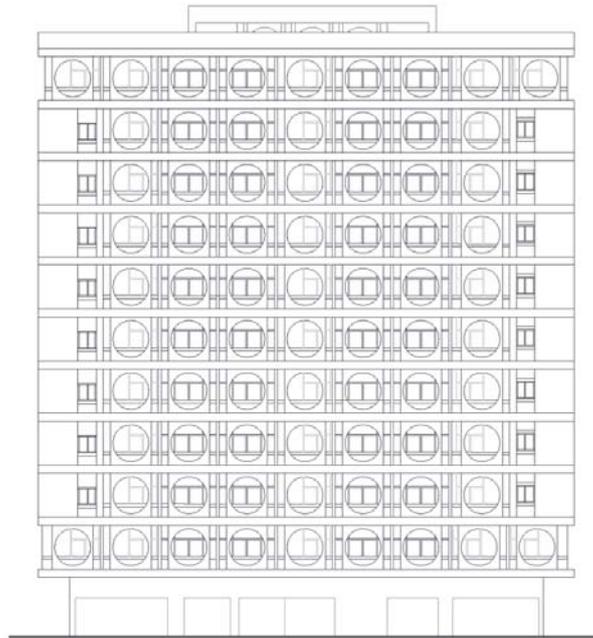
Example of elevation 2D drawing generated from photograph of the Obaid Building, Electra street, Abu Dhabi. Illustration by the authors
